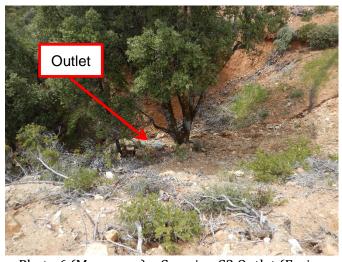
(Magnuson) - Crossing C3 Outlet (Facing Southwest)
